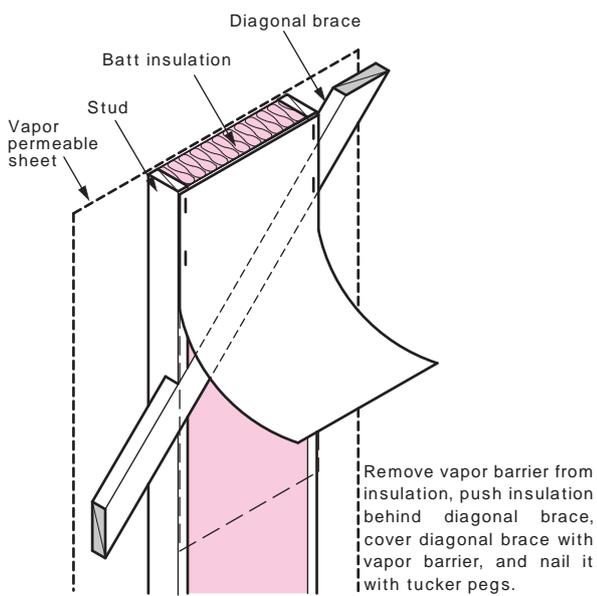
Exterior wall insulation (insulation material with vapor barrier on load-carrying wall with diagonal brace)
